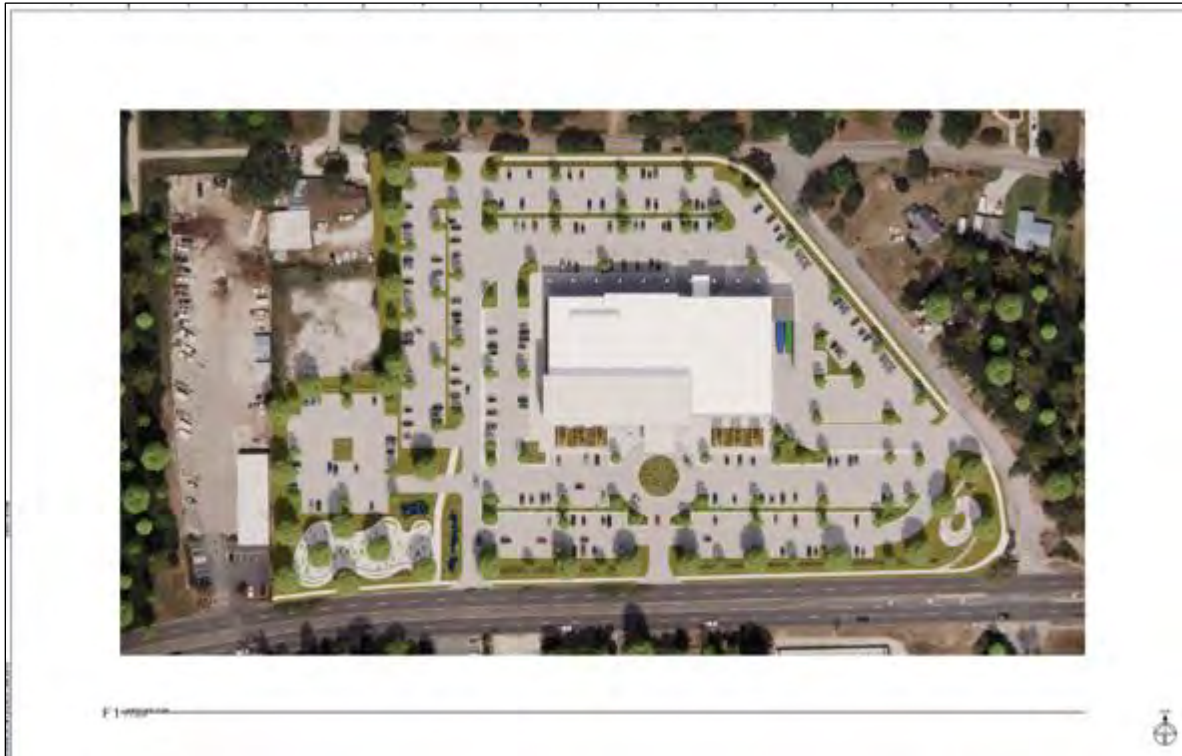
Site 3 Proposed OPC Concept Development Plan.
